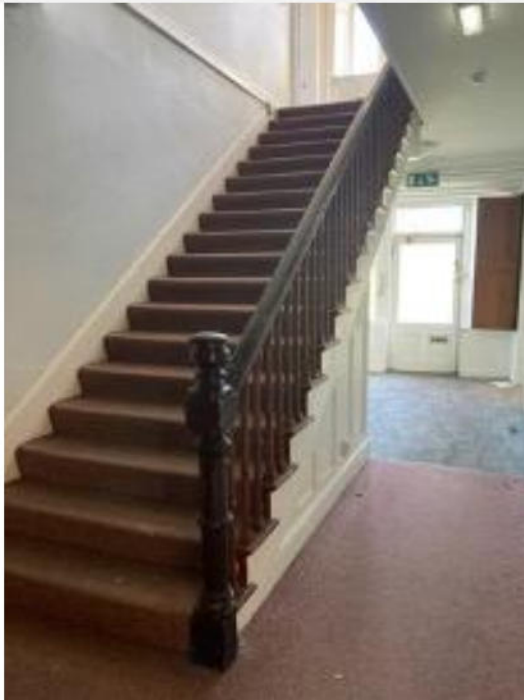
Open tread, timber stair in north-east bay. Turned newel post and timber handrail.
